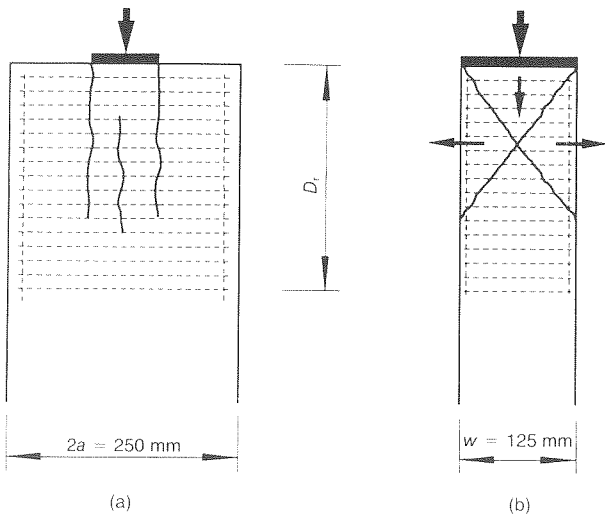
Out-of-plane wedging failure in highly reinforced prisms: (a) front view; (b) side view
